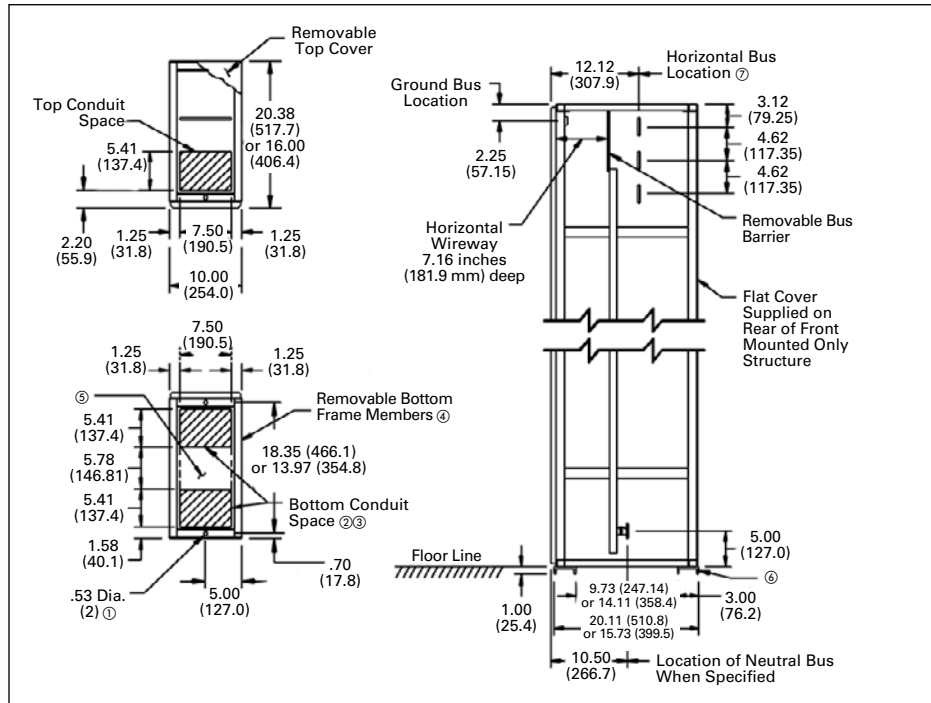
10.00 Inches (254.0 mm) Wide, 16.00 or 21.00 Inches (406.4 or 533.4 mm) Deep—Transition Structure—Dimensions in Inches (mm)
